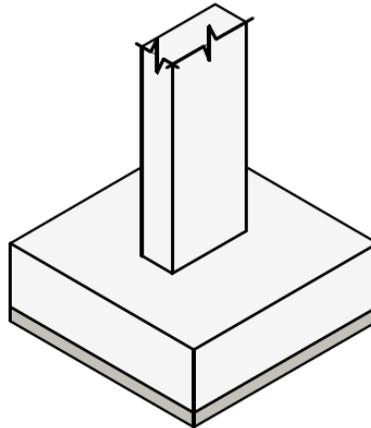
ISOMETRIC VIEW OF SCHEMATIC CORE WALL ARRANGEMENT
